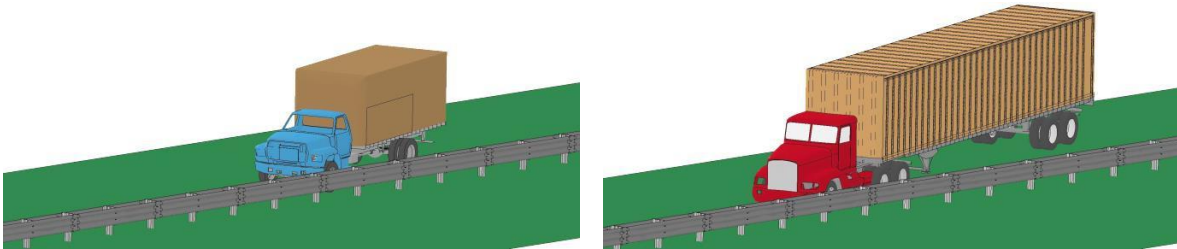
A steel-blockout Thrie-beam guardrail impacted by a single-unit truck (left) and a tractor-trailer (right).
